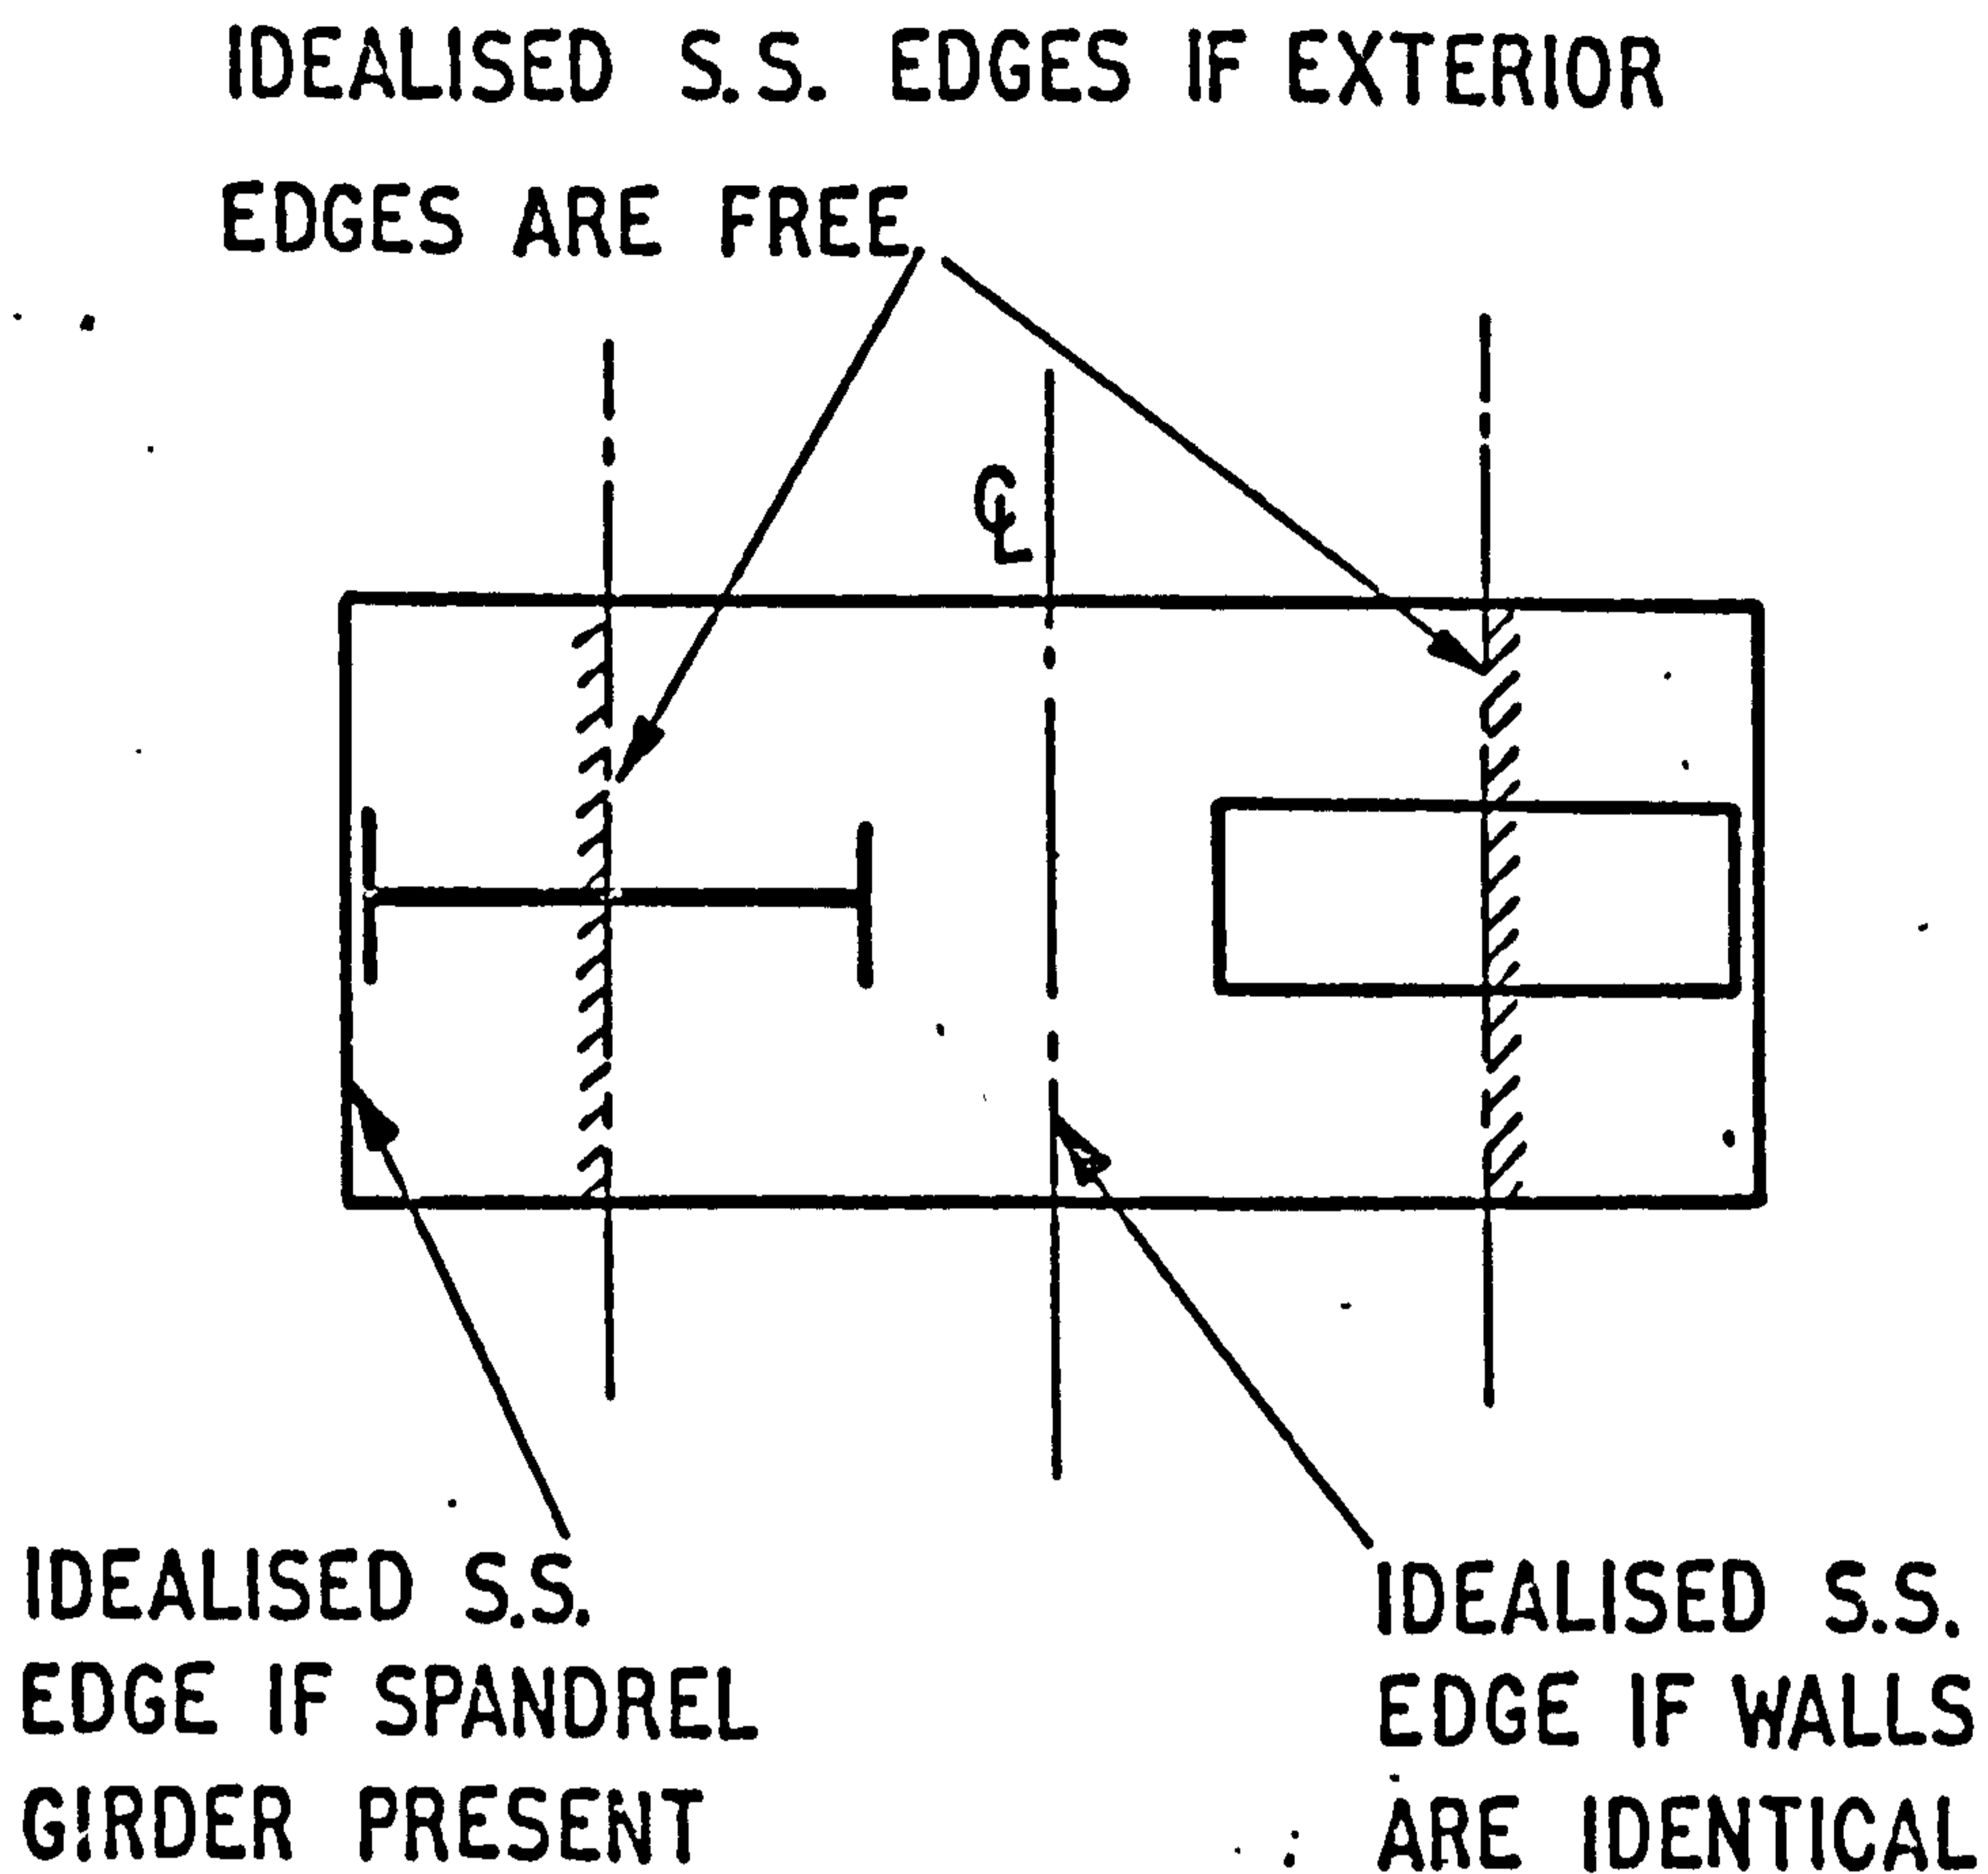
Typical Floor Plan with Dissimilar Coupled Walls
